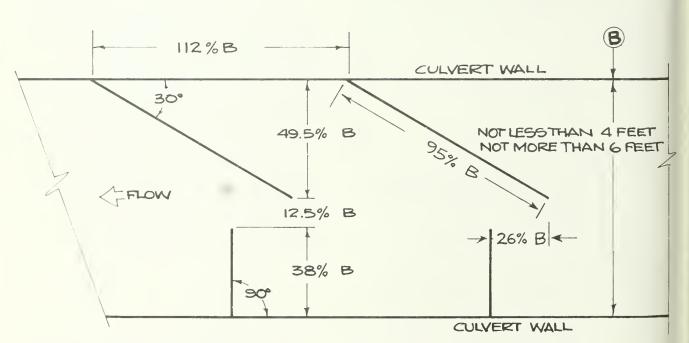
Baffle-pattern arrangement for metal culverts (after Evans and Johnston 1974). B equals clear width of box culvert, intercept width is 1 foot above invert (round or arch culverts), and all baffles are 1 foot high.
